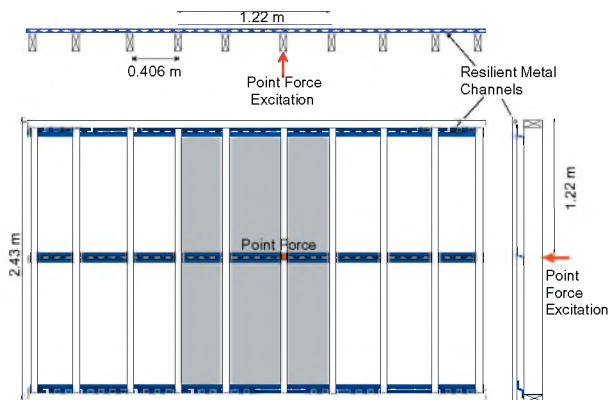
Sketch showing wall framing and the single sheet of gypsum board mounted on RC's.
